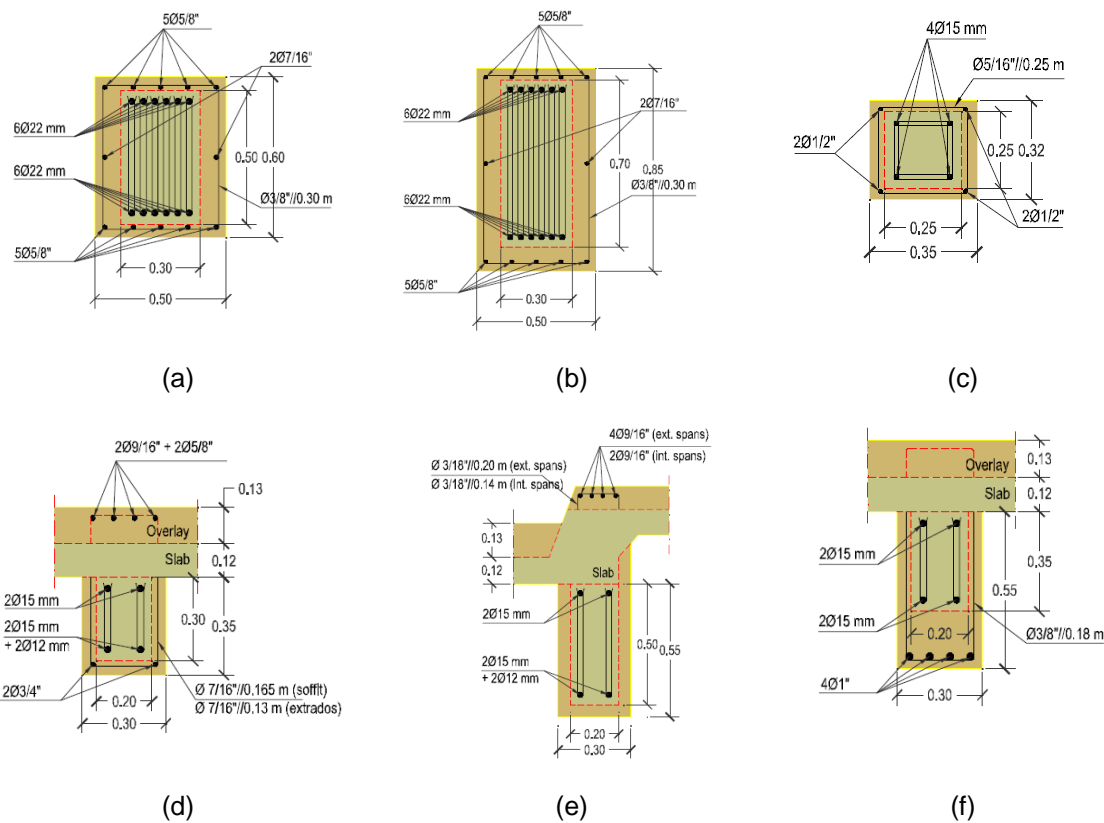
Current cross-section geometry (a) arches at mid span (b) arches at the abutments (c) columns (d) intermediate longitudinal girders (e) lateral longitudinal girders (f) transverse girders [33]
